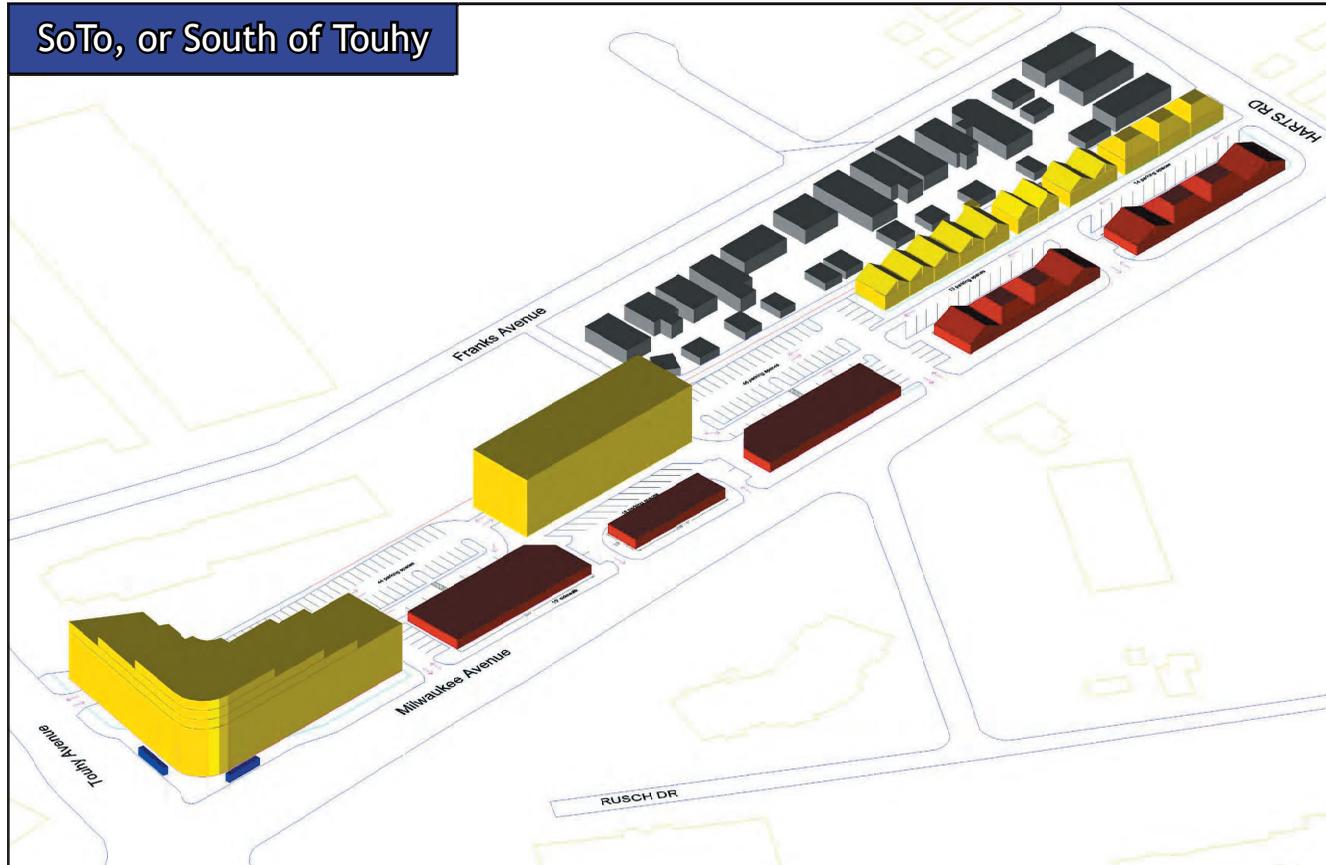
A three-dimensional extrusion of the SoTo conceptual site plan shows the potential to create a landmark building at the corner of Touhy and Milwaukee Ave. The corner building would have a mix of retail on its ground floor and dwelling units on upper floors, and would require underground parking for resident units. Transit stations are shown on the Milwaukee and Touhy Ave. sides of the site, with bus turn-out lanes on both streets. A second residential building is shown to the back and middle of the block with small retail buildings fronting on the sidewalk. The south end of the site near Harts Road is designed with rowhouse type dwellings in scale with the houses across the alley to the east. The concept is to create a thematic setting for boutique-style shops through the use of gabled and hipped roofs on the row-houses and the facing retail buildings, and to create a street setting for the shops and parking area, rather than the typical strip mall layout. The emphasis is on placemaking, which also includes small outdoor plazas between the middle residential building and the adjoining retail buildings.
